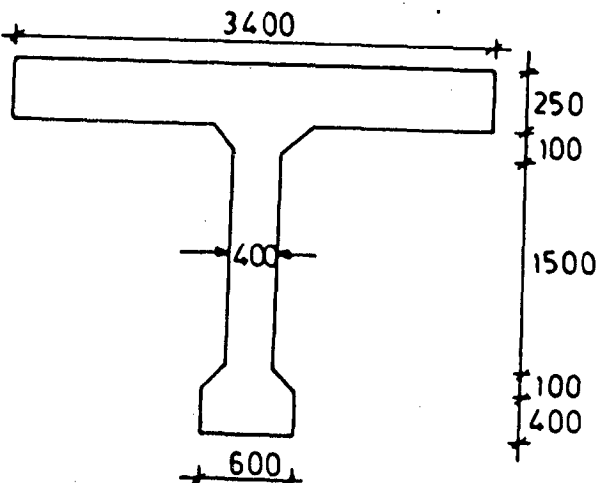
4-LANE, 5-GIRDER BRIDGE DECK
